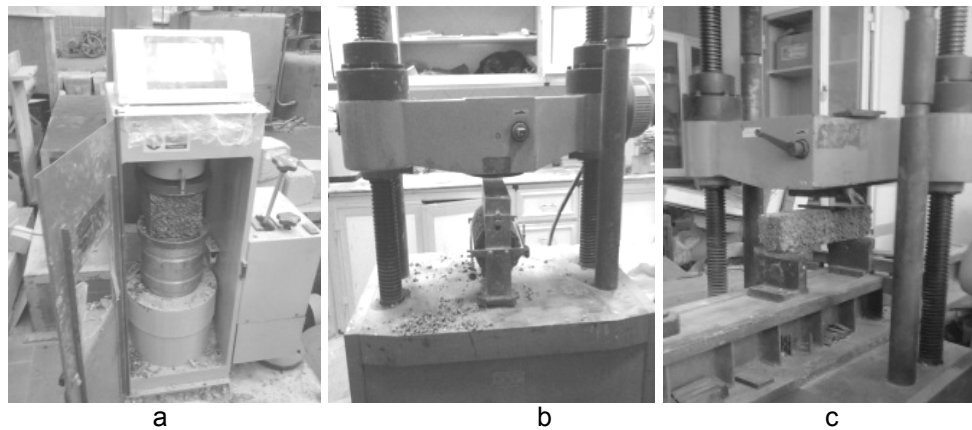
Tests on Hardened Concrete: a) Compression Test, b) Splitting Tensile and c) Flexure Test
